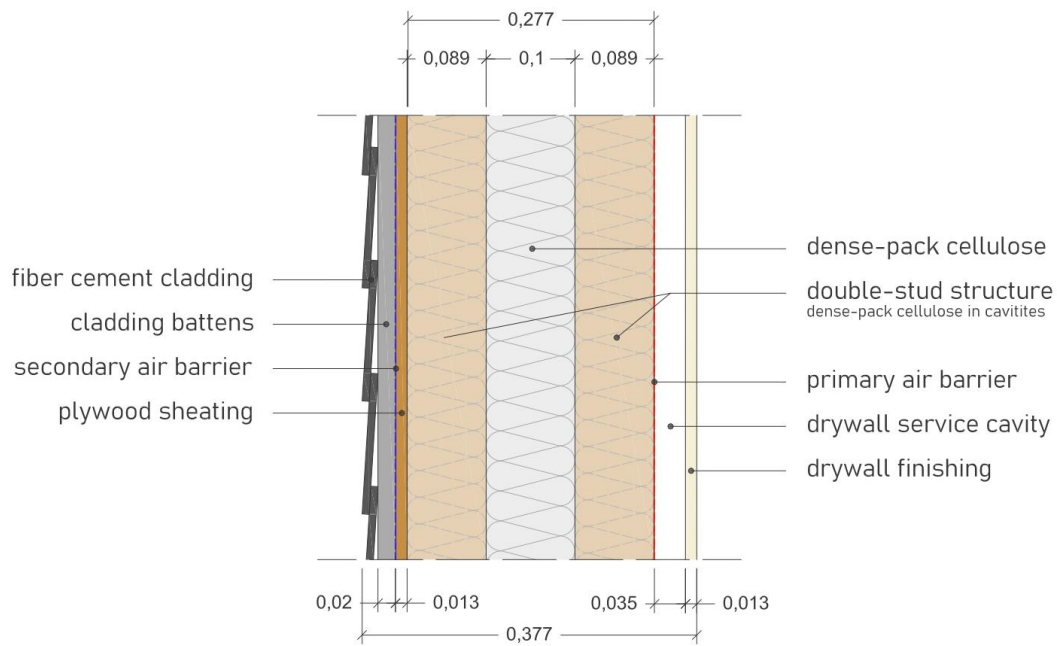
Exterior walls detail section. Dimensions in meters. Own elaboration.
